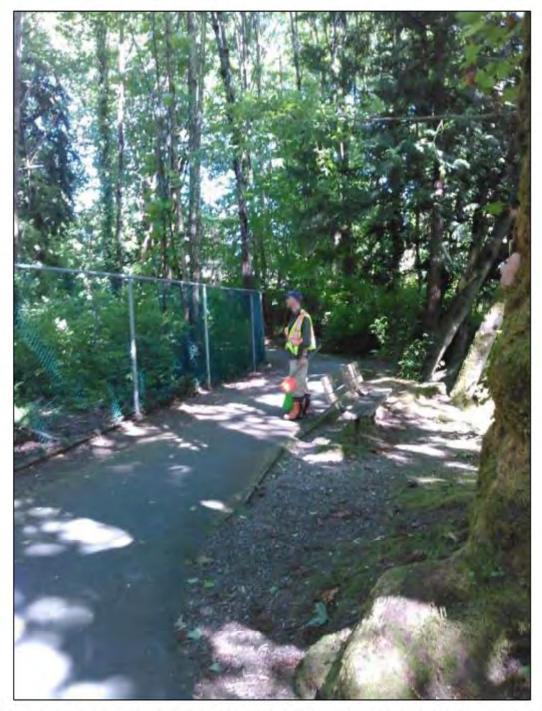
Looking southeast at the proposed tie-in point between the new creek segment and Maplewood Pond.
